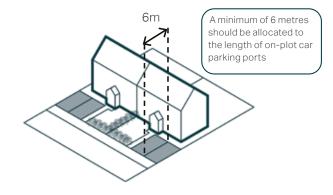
Illustrative diagram showing an indicative layout and minimum dimensions of on-plot front parking.
